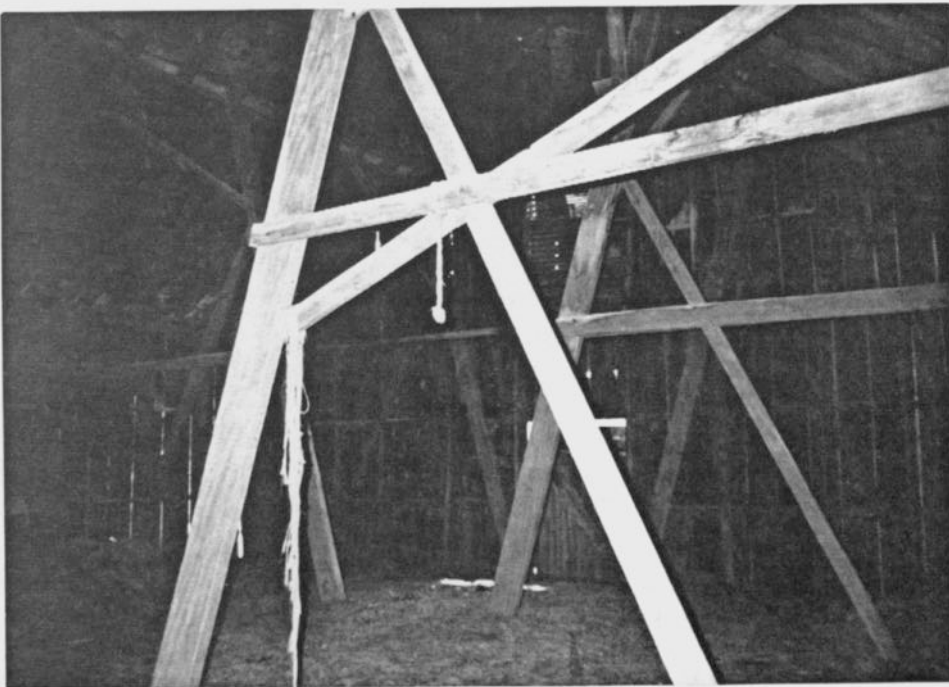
New angle bracing to roof, upper level of Grimm barn
